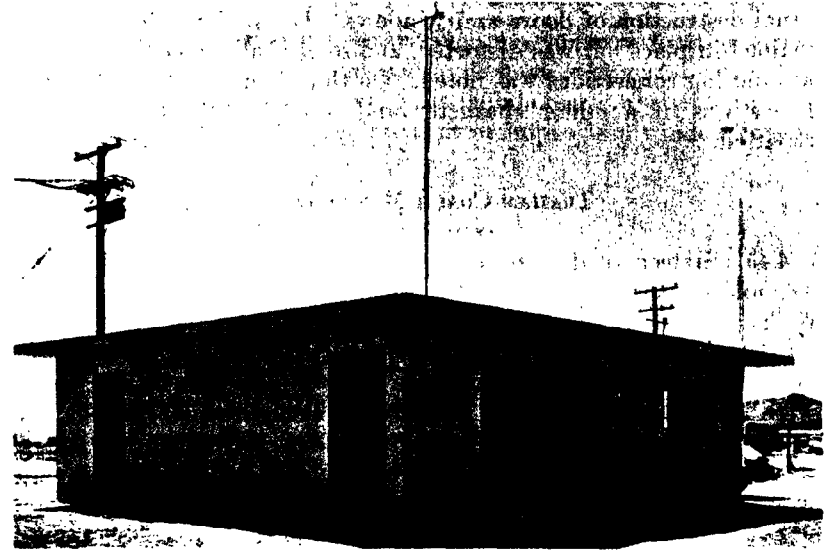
Reinforced masonry-block house before a nuclear explosion, Nevada Test Site.
